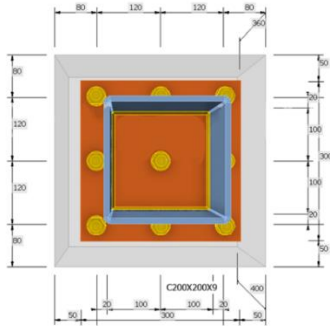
Column and Pedestal weld and bolts connection (top view)
